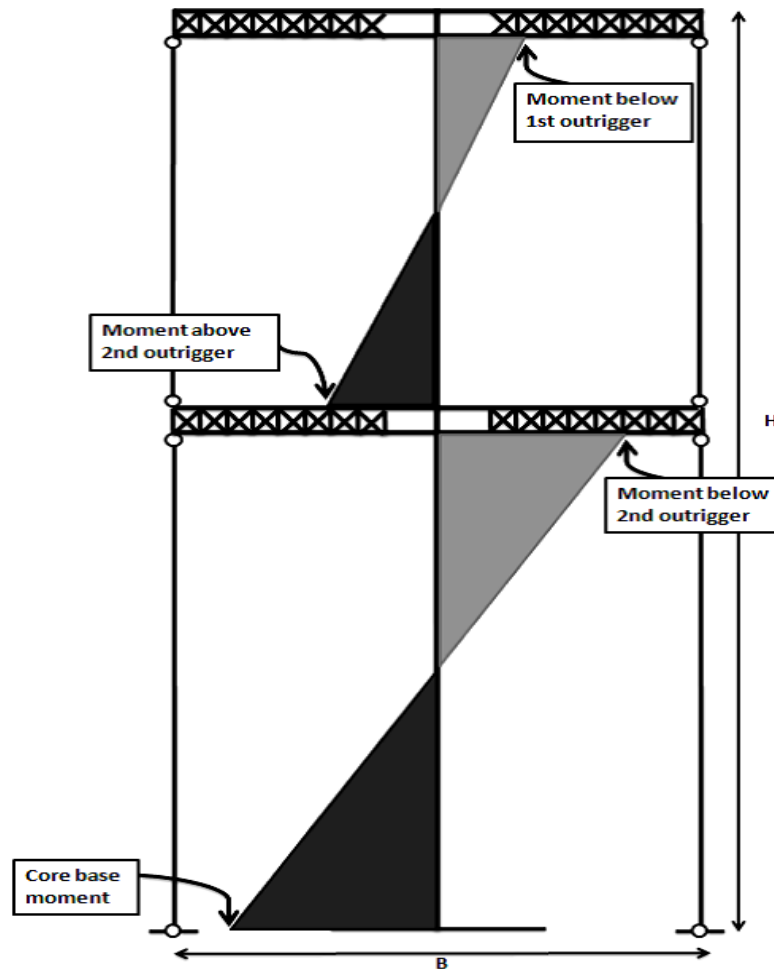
The typical behaviour of a system with very stiff concrete core along with outrigger and belt truss.
